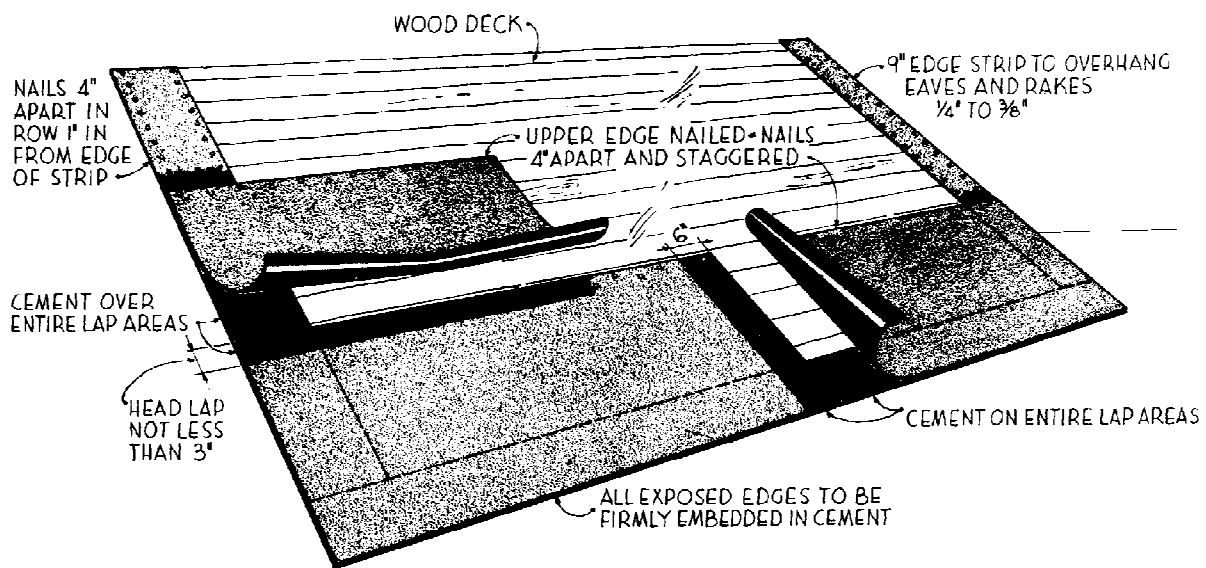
Application of roll roofing by concealed nail method parallel to the eaves.
